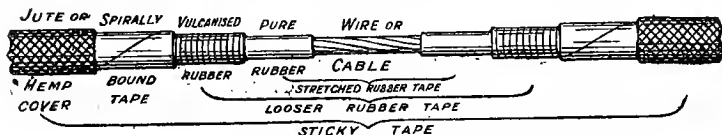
Showing layers of insulation and cable ready for jointing. The extent covered by successive wrappings of fresh insulating material, after jointing, is also indicated.
